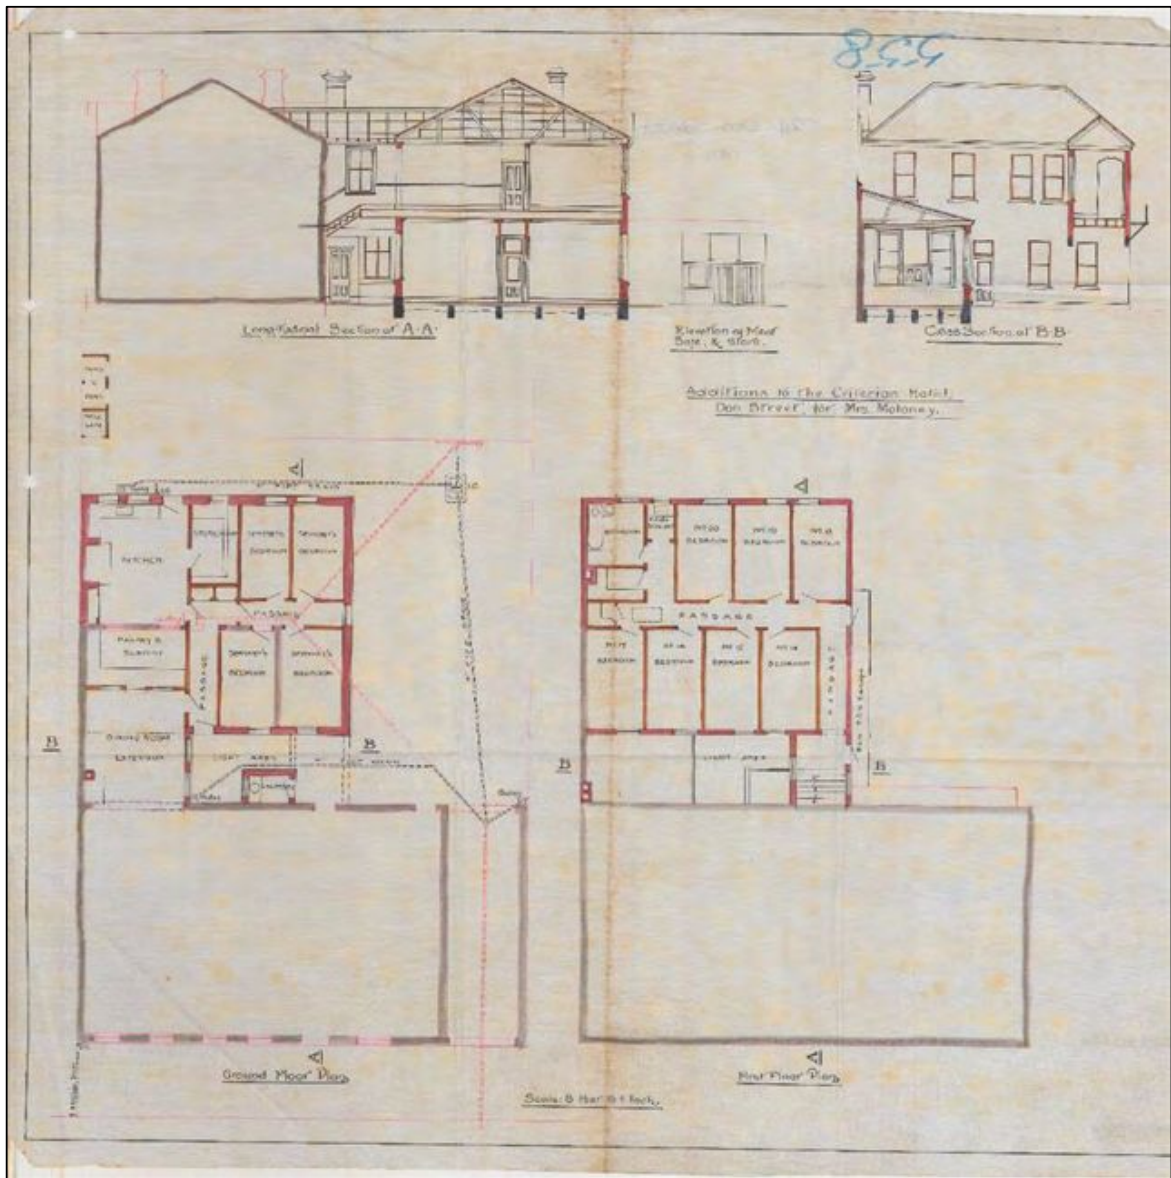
Additions to the Criterion Hotel, Don Street, for Mrs Moloney (ICC Property File). The additions are shown in pink and brown, while the original walls are shown in grey.
